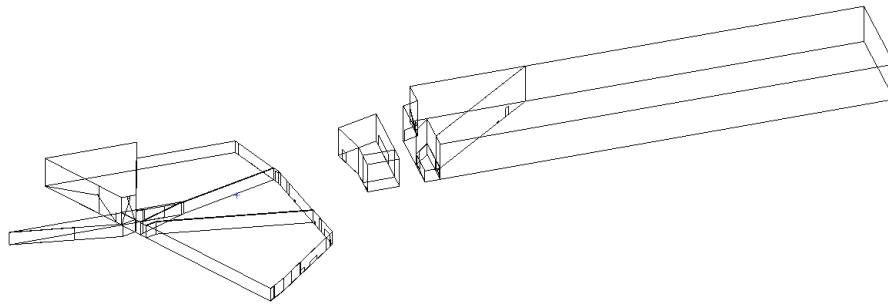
F2050 reconstruction from 15mm voxel filtered ground floor scans
